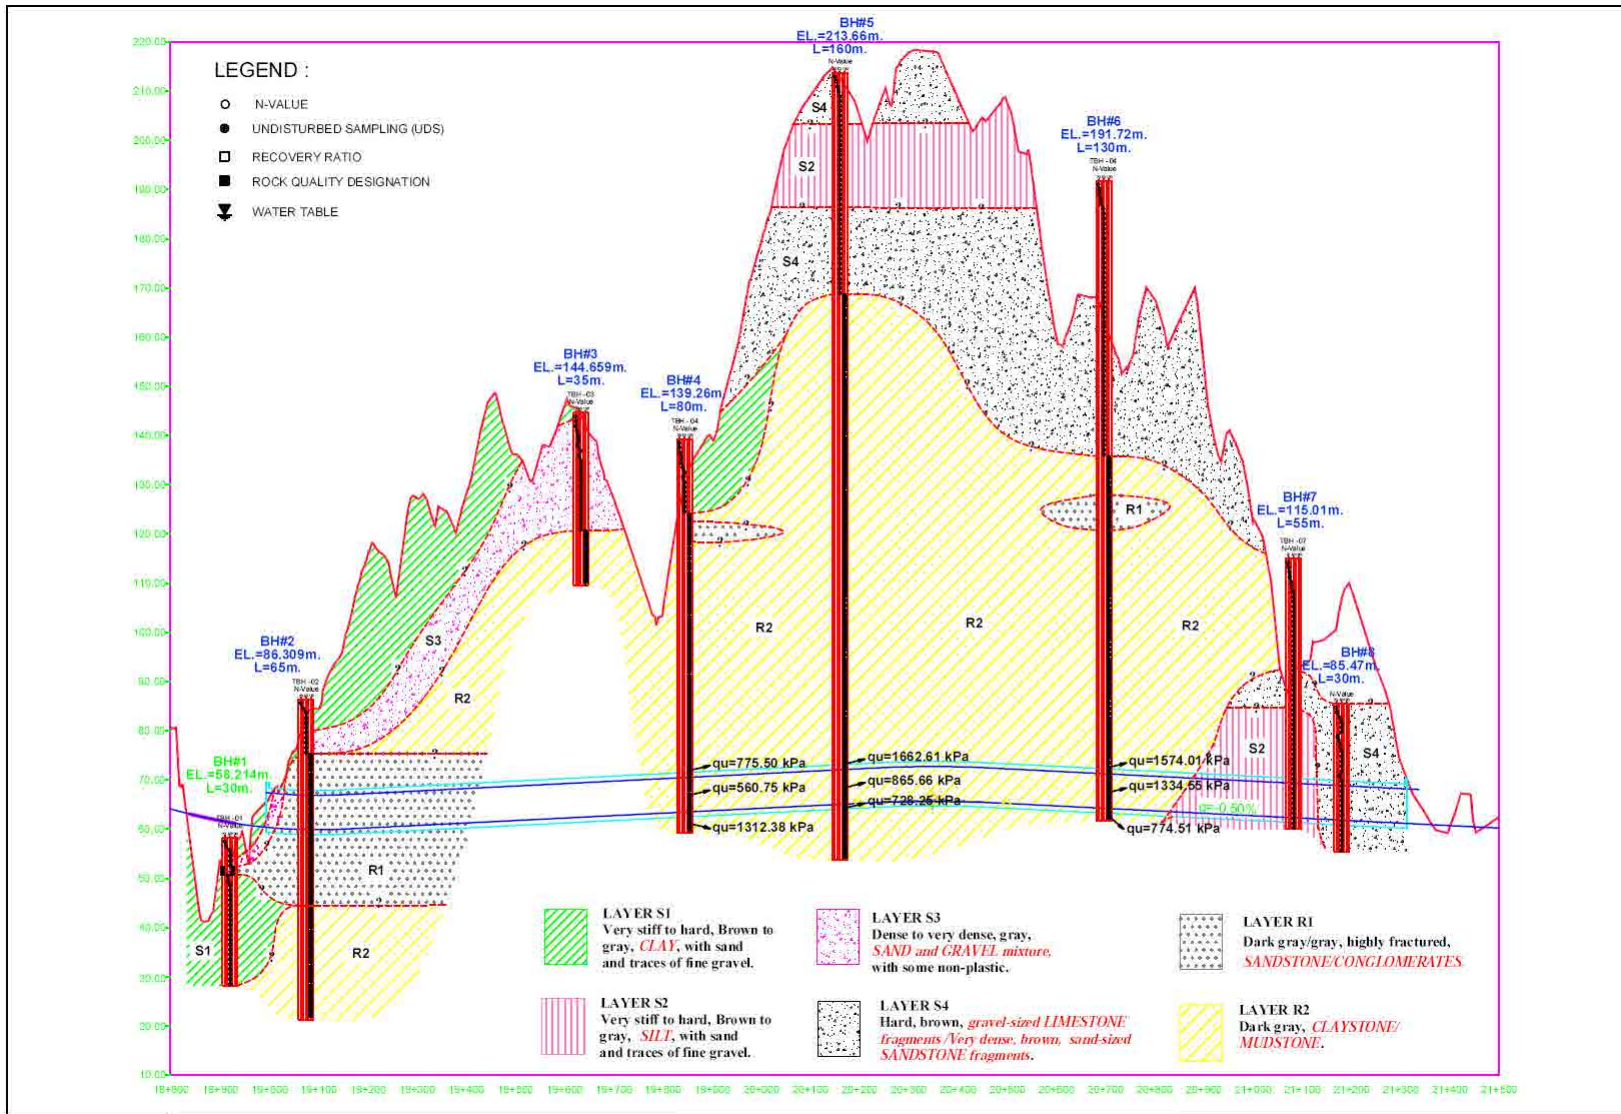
GEOLOGICAL PROFILE OF TUNNEL SECTION
